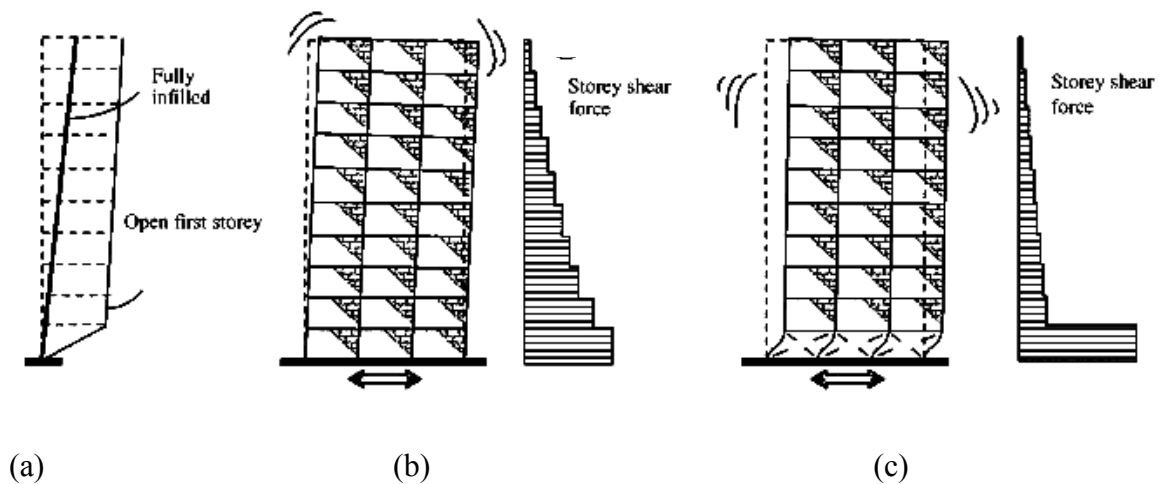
Effects of masonry infills on the first mode shape of a typical frame of a ten-story RC building a) Displacement profile b) Fully infilled frame c) Frame with open ground floor (EERI, 2001)
